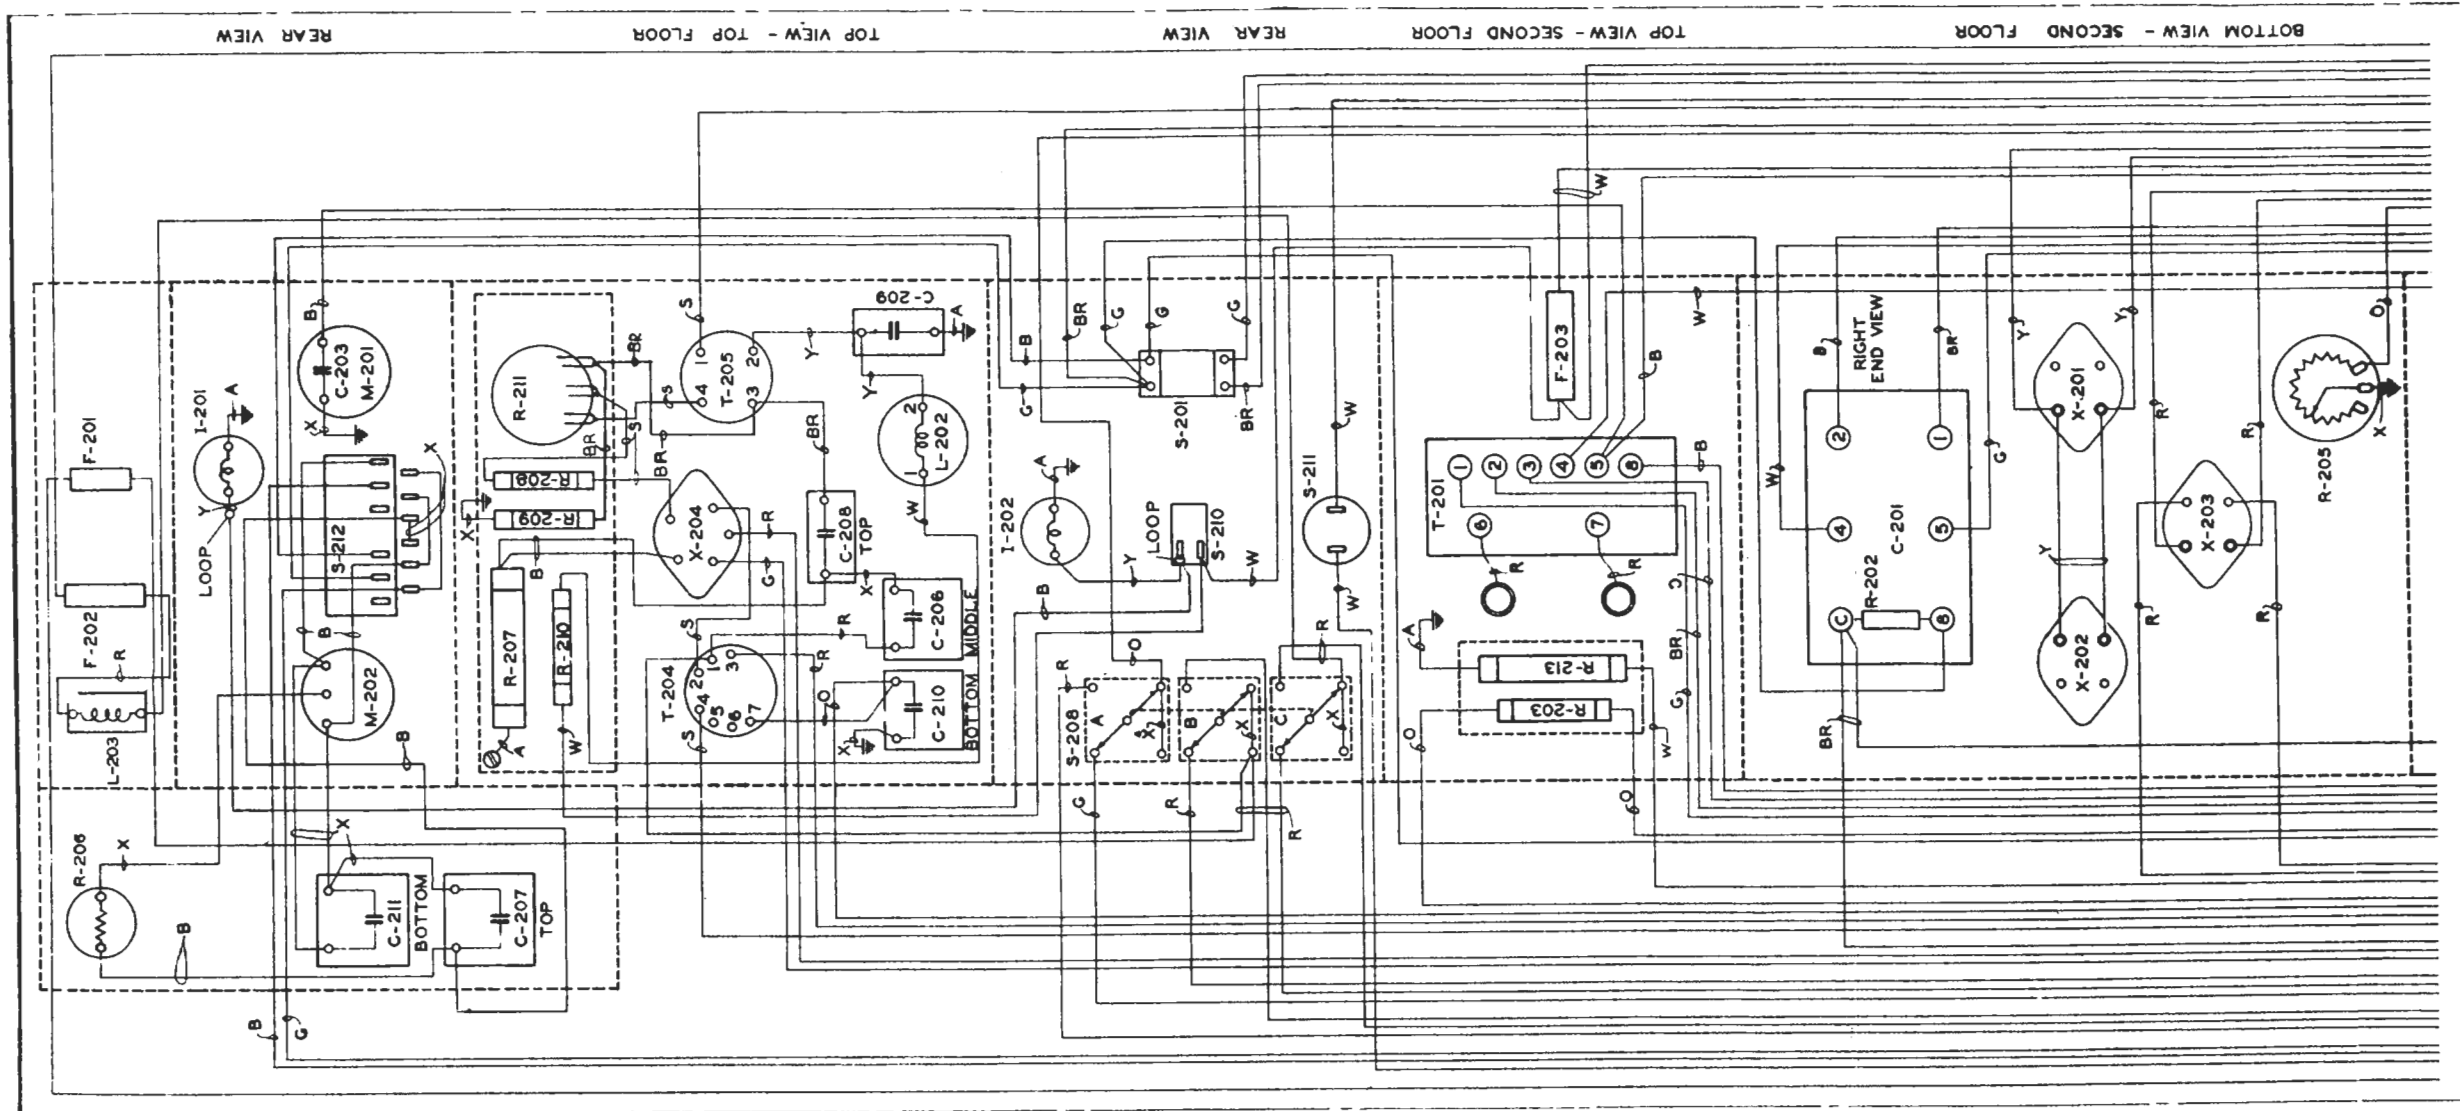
Rectifier Modulator Unit, Type CAY-20084 Wiring Diagram (Drawing W-7300380)
